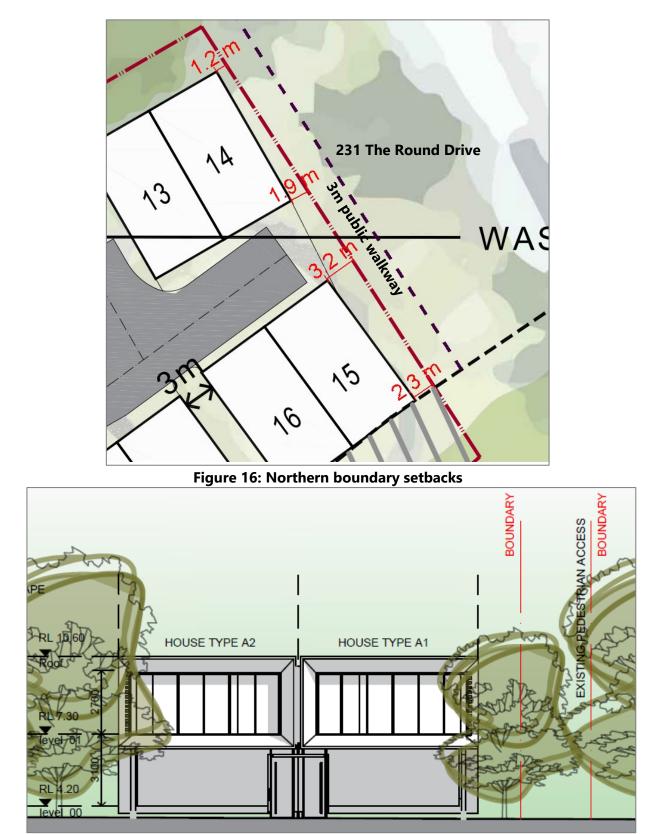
Northern elevation of dwellings 13 and 14, showing 3m pedestrian access to the north
